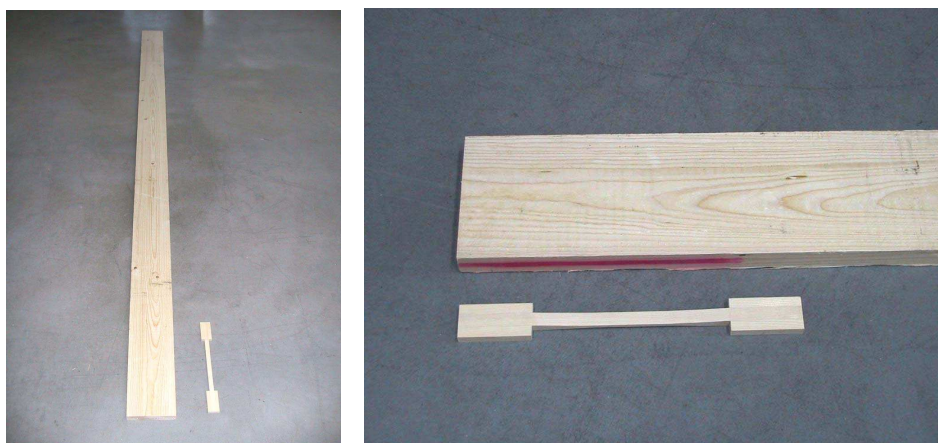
Test specimen for tensile tests; full-size vs. clear-wood specimen
